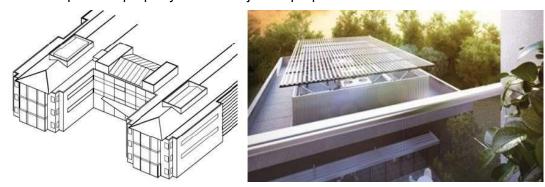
a. Two examples of effective rooftop equipment screening. These images show how rooftop mechanical equipment can be located and screened effectively including side walls and a trellis to screen views from surrounding taller buildings.
